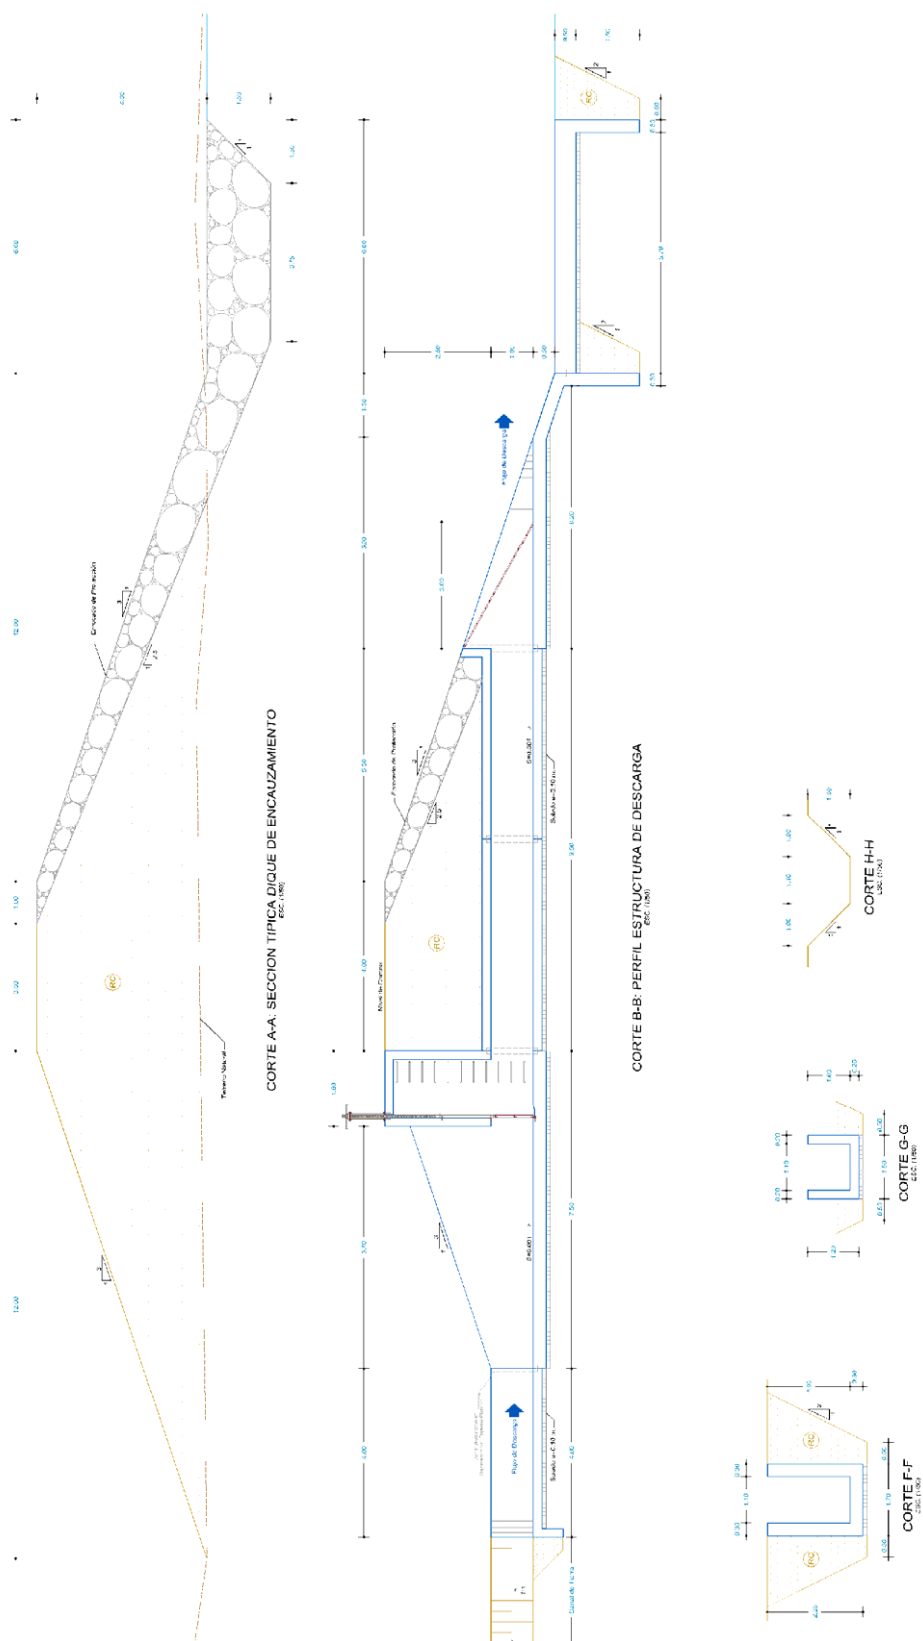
Structure Drawing of Drainage Facility Type I (2/2)
